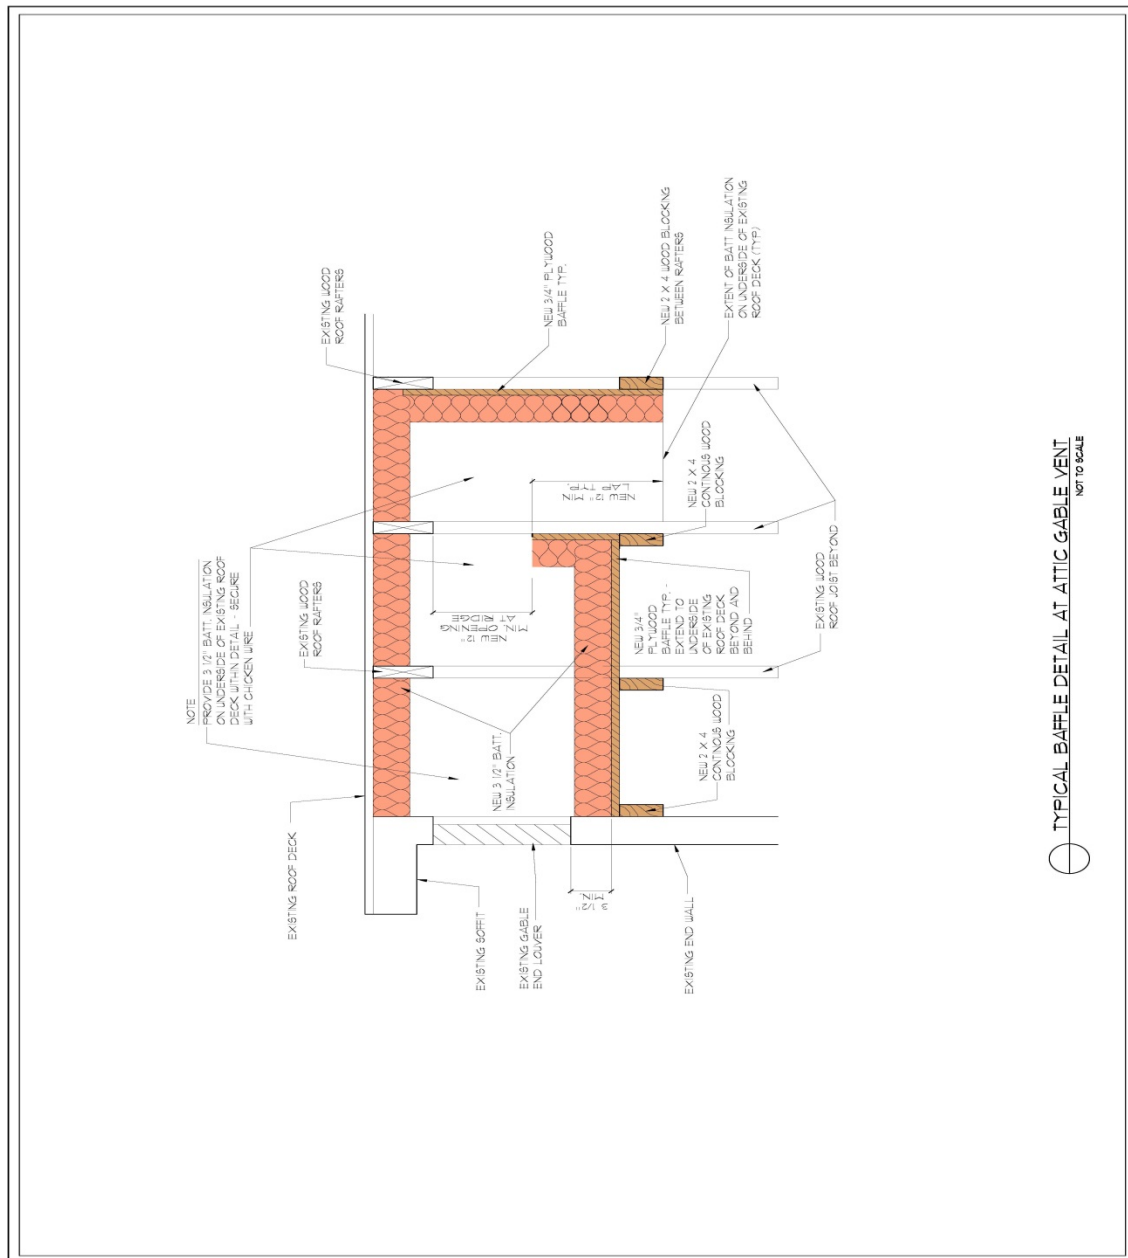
Typical Baffle Detail at Attic Gable Vent
